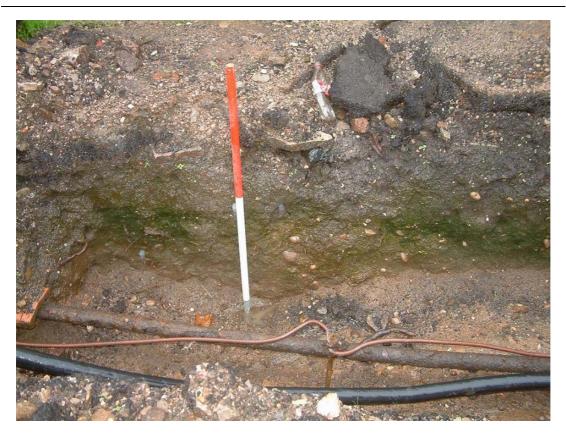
Trench associated with electrical sub-station within car park on west side of site, south section, view west-south-west
